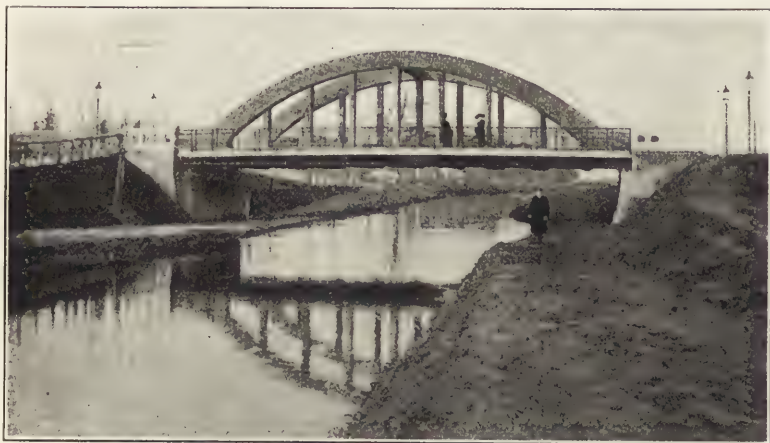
Obra Bridge near Kosten. Ordinary Reinforced Concrete Bridge of 22 Meters Span.
